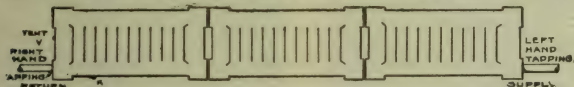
Assembled Three Horizontal Sections in Single Tier One and Two-pipe Steam
